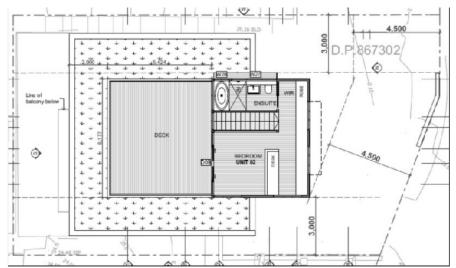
Second Floor Plan - DA17 Issue L (Source: mm+j architects)
